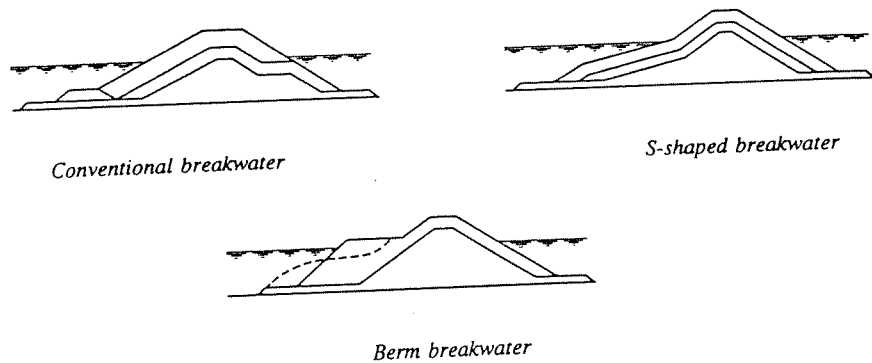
Typical cross-sections of three types of rubble mound breakwaters.
